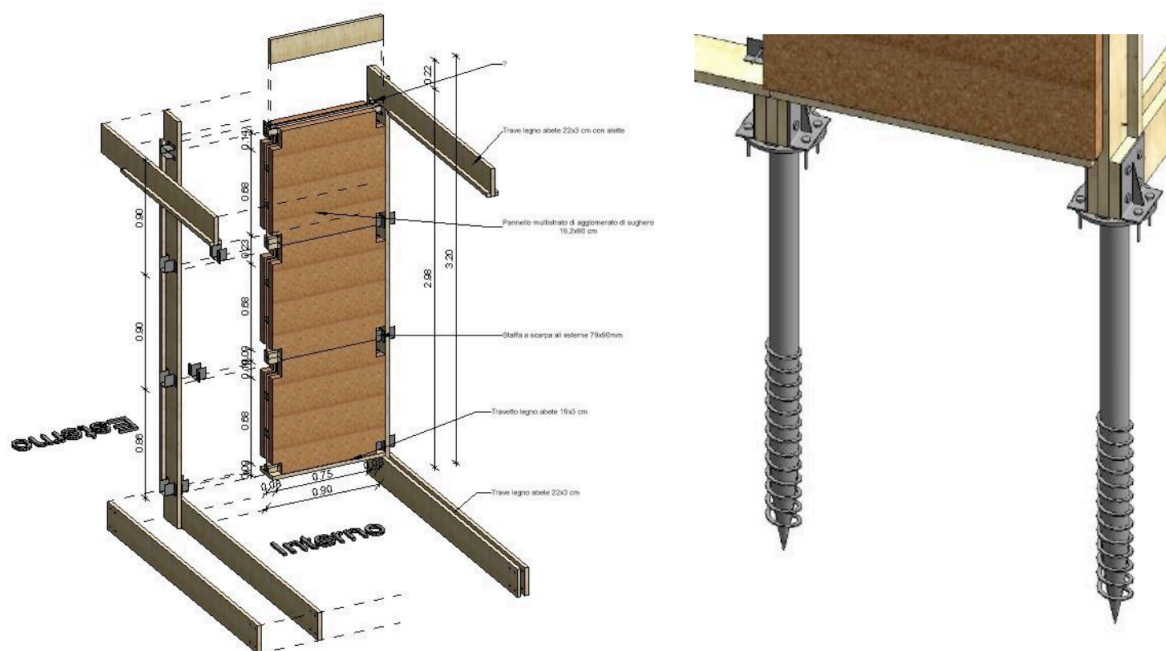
Structural design of the basic module, featuring (a) a shear wall and (b) screw foundations.
